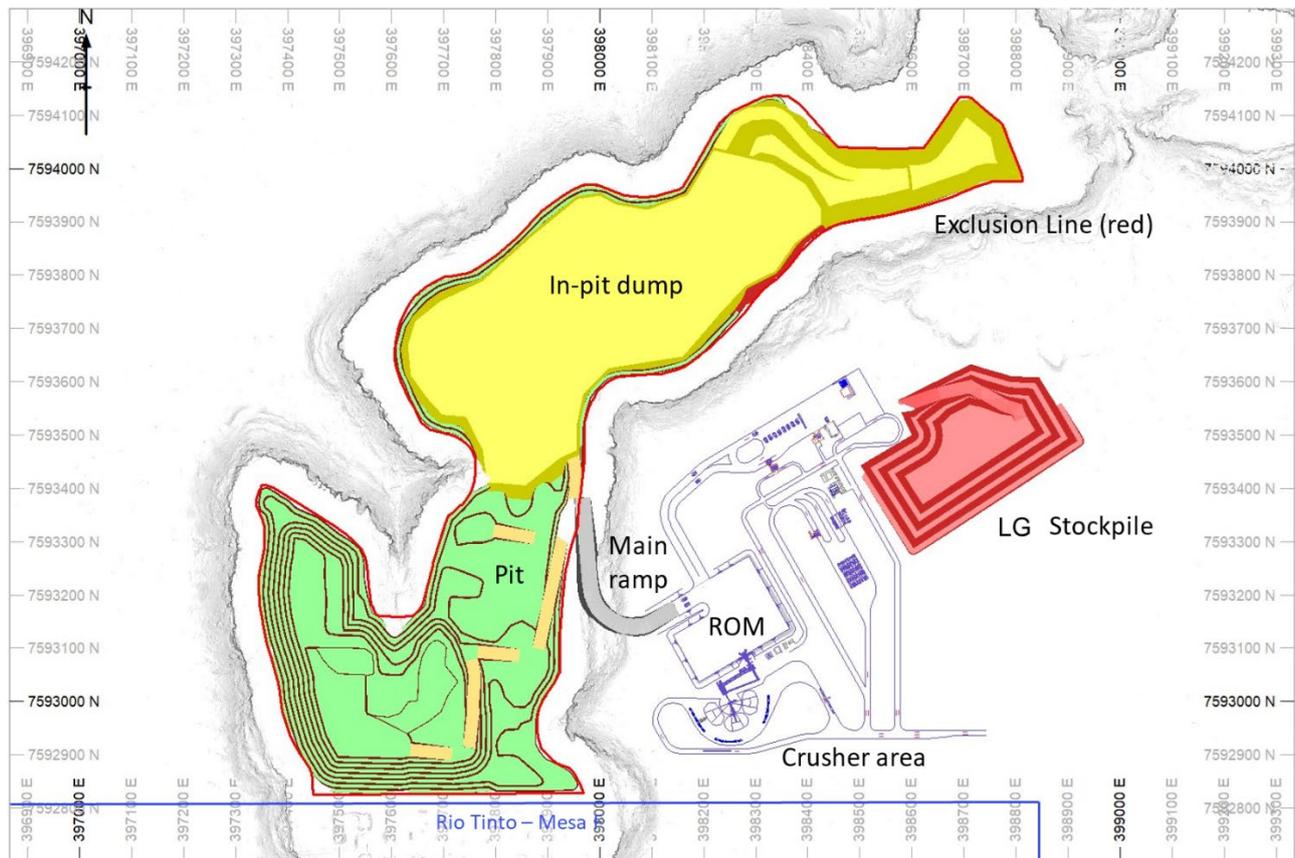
Robe Mesa Site Layout – Final pit with in-pit waste dumps, mine operations centre, processing plant and LG stockpile
